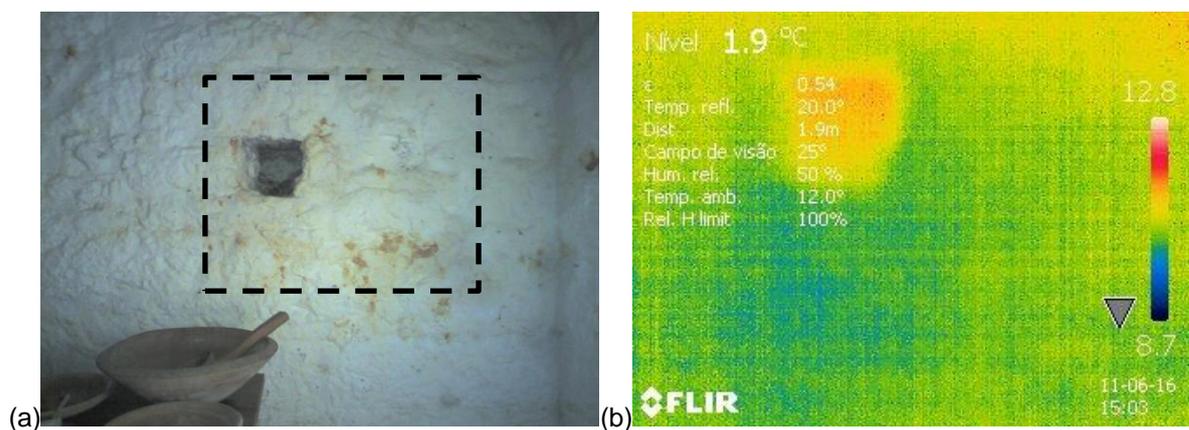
Slight moisture detected in walls of kitchen with wall socket showing up warmer due to thinner wall in this region
